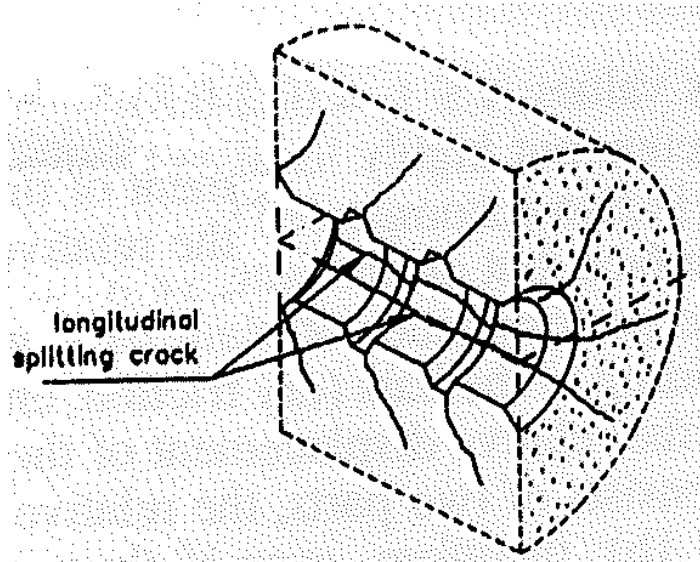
Longitudinal splitting and transverse cracks (Federation internationale du beton, 2000)
